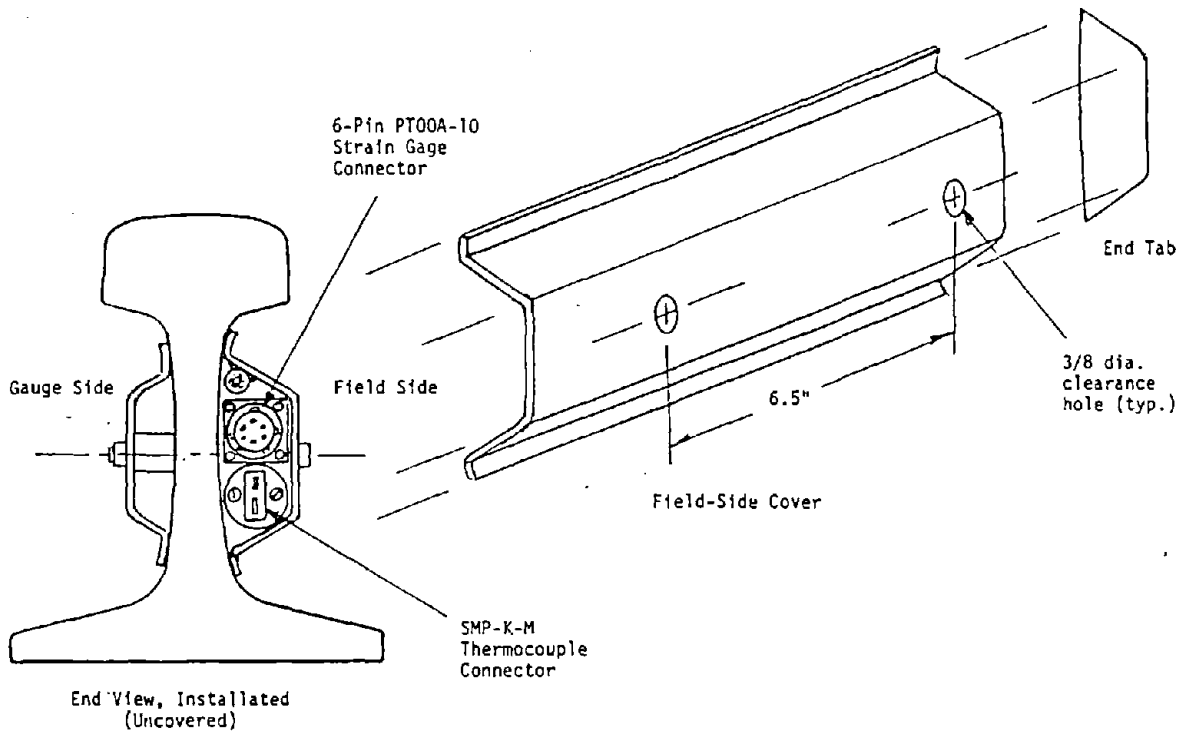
SKETCH OF RNT INSTALLATION PROTECTIVE COVERS
